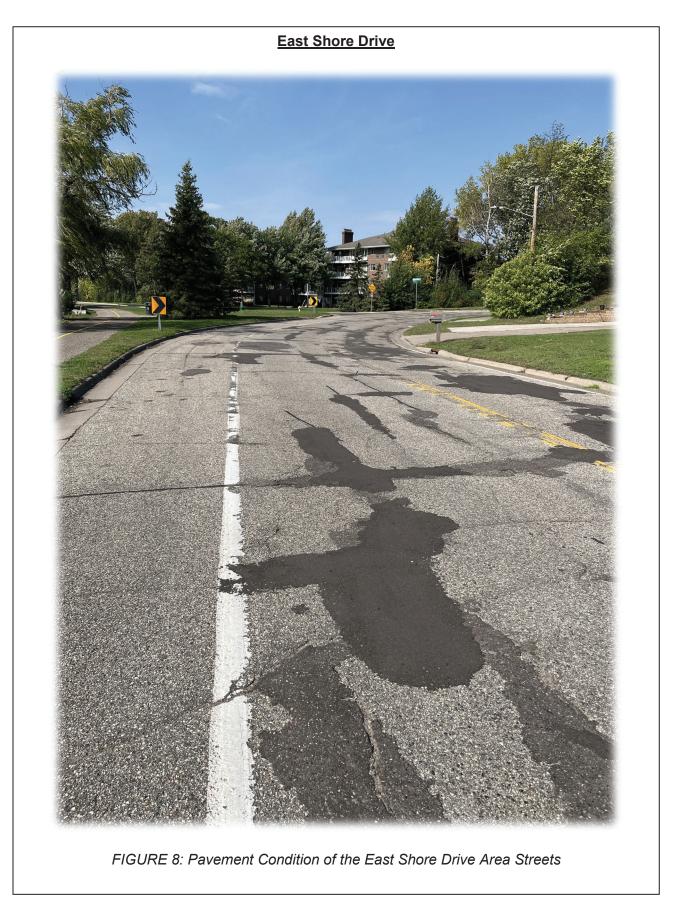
Pavement Condition of the East Shore Drive Area Streets
